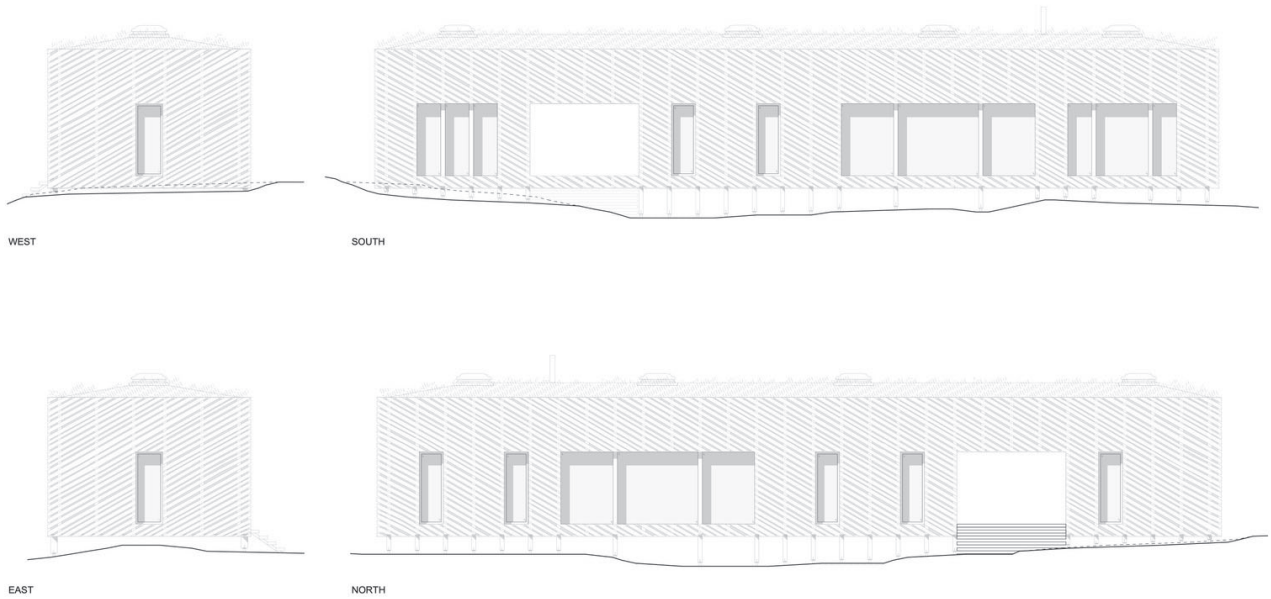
| BUILDING ELEVATIONS, PHOTO CREDIT | ARCH DAILY
